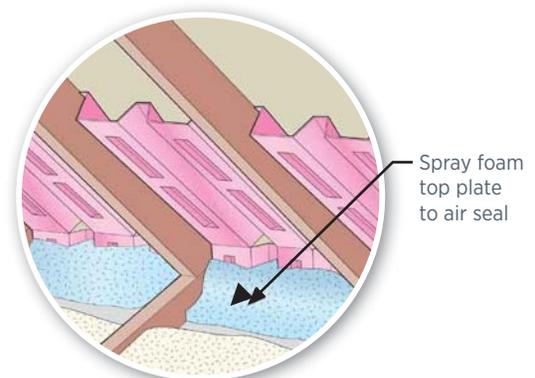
Pull back insulation to seal drywall to top plate with spray foam, caulk, or other sealer (Lstiburek 2010).
